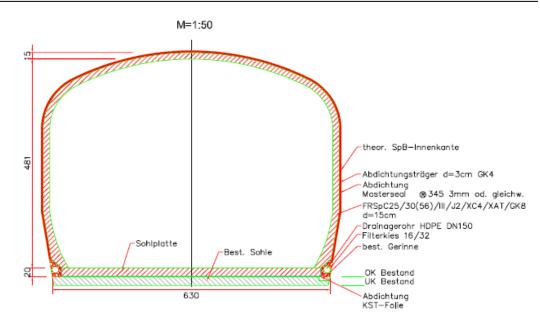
Typical cross section and proposed refurbishment measures [iC]
